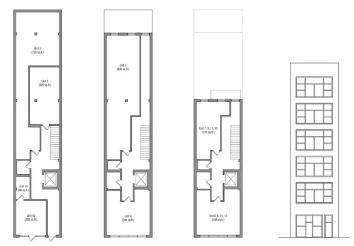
, 98, 99, 100 (left to right): Building 3, first (ground) floor (1925); second floor (1925); floors 3-6 (1925); street-front elevation (1980). 1'' = 32'. For plans, north is down.
